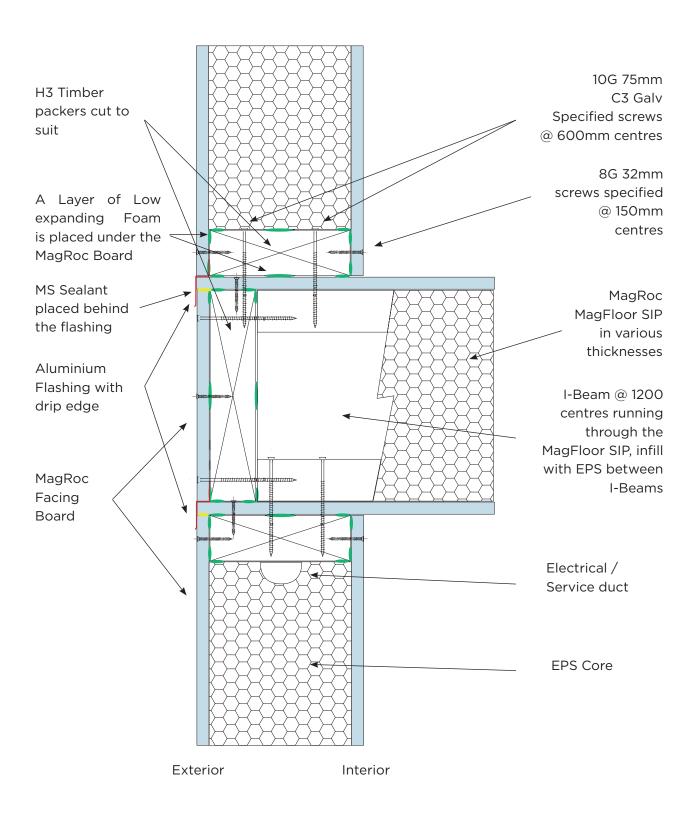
MagRoc 'Typical' Mid Floor with Direct fix cladding
